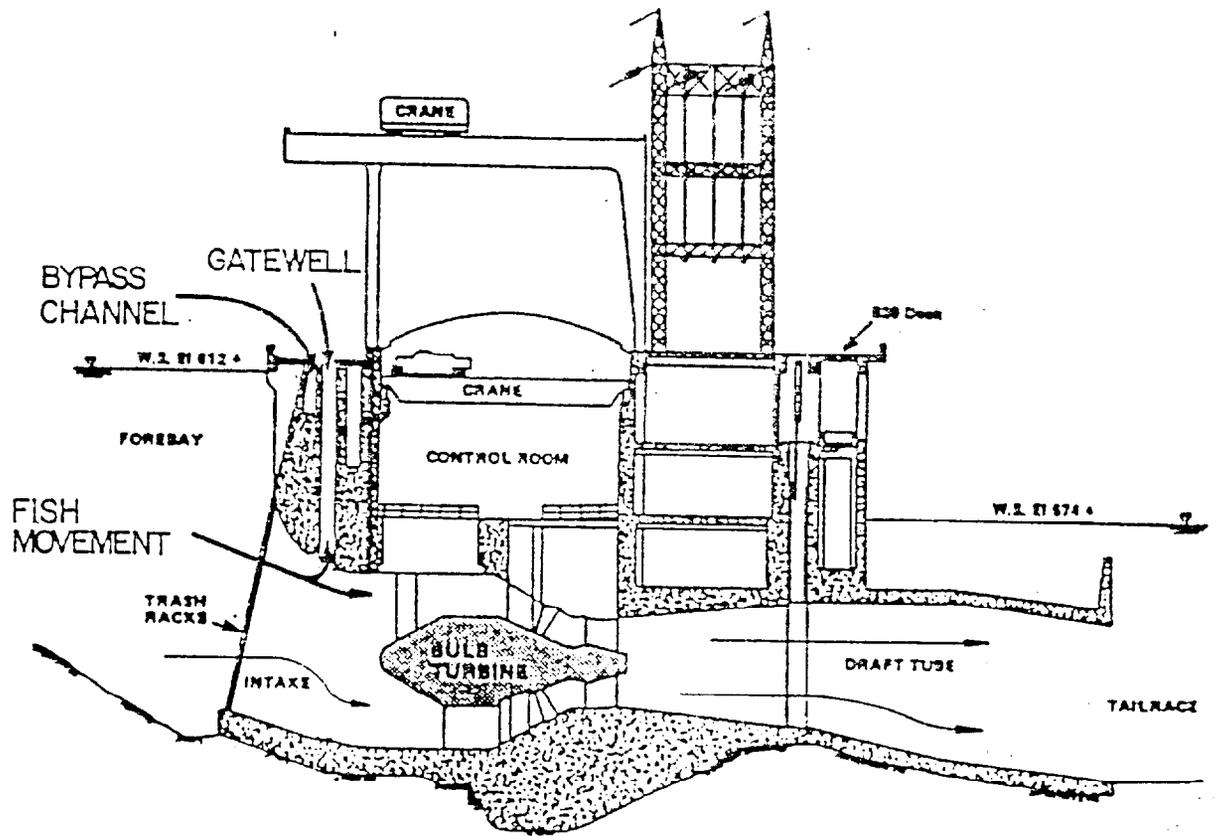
Section through Rock Island Dam second powerhouse indicating fish movement into gateway system.
